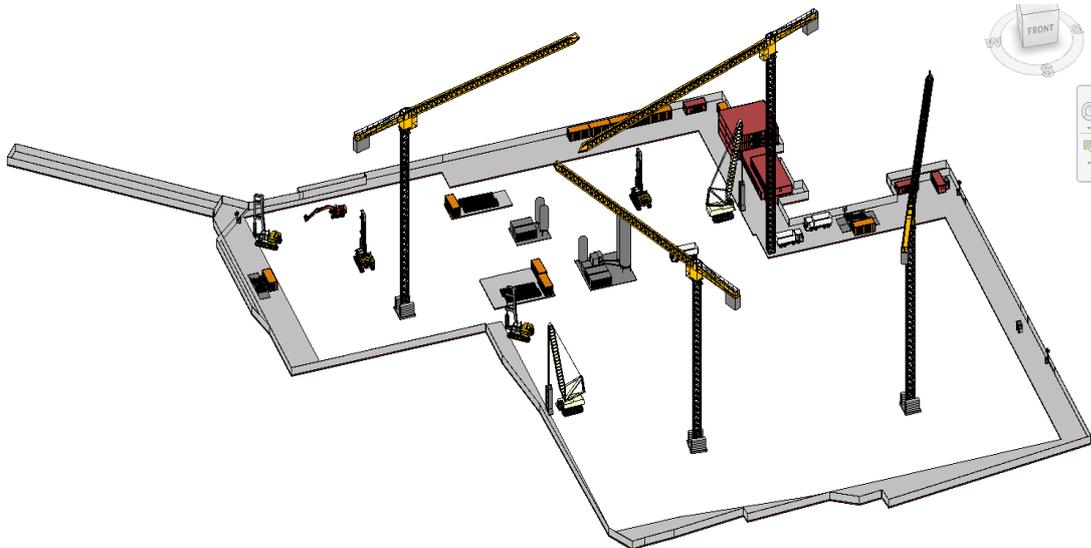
Site BIM model with required facilities and machineries (Source: WeBuild S.p.A.)
